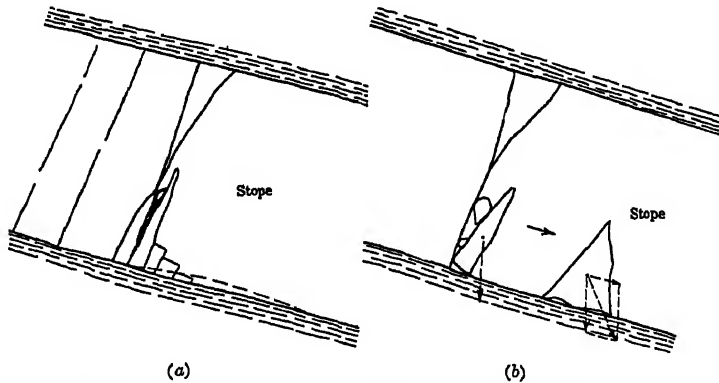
(a) HEAVE BREAKING ORE FROM FACE OF PILLARS, PARTICULARLY AT BOTTOM.
